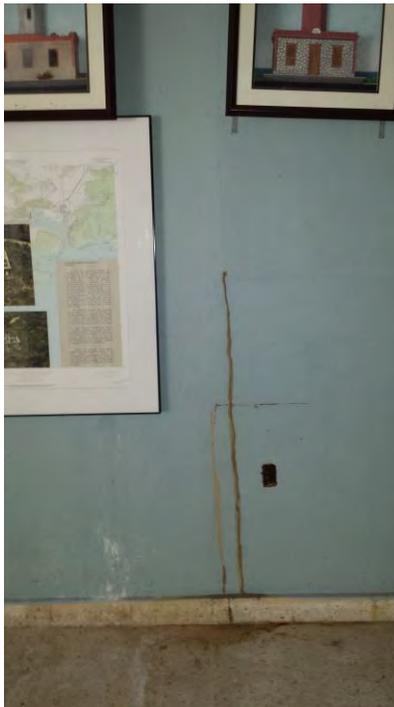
Ancillary Buildings and Structures – Entrance/Administrative Building at Southern Entrance to Dome – with Signs of Termites (“Mud Tubes”)
